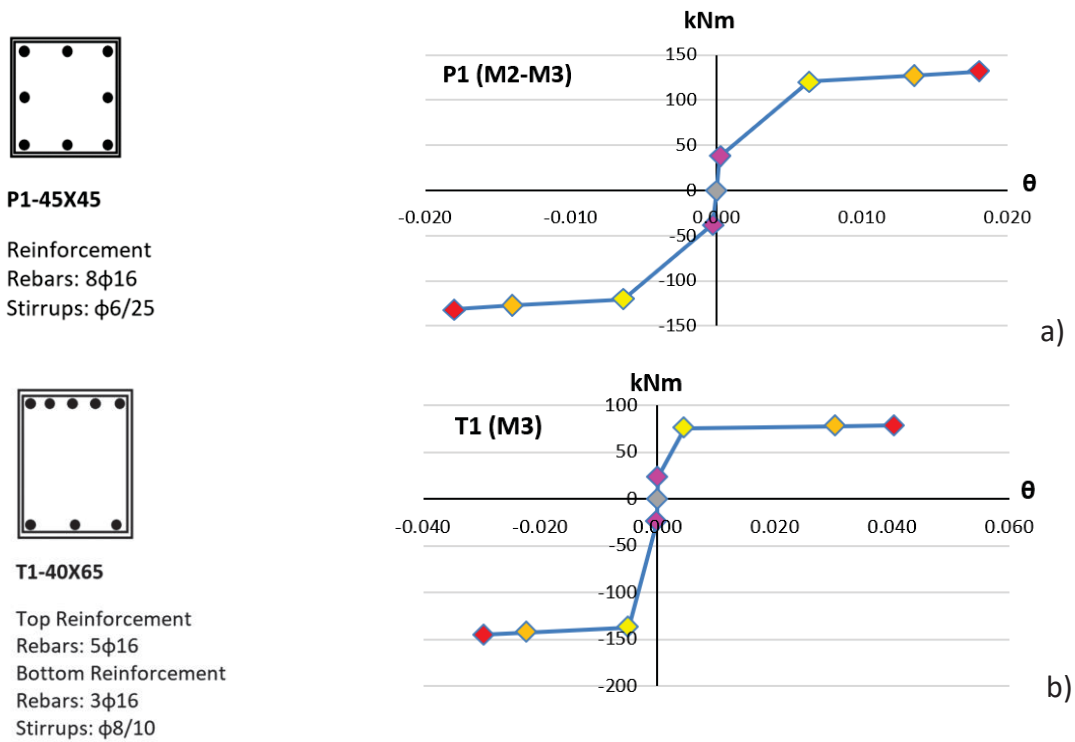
Plastic hinge modelling of column (P1) and beam (T1).
